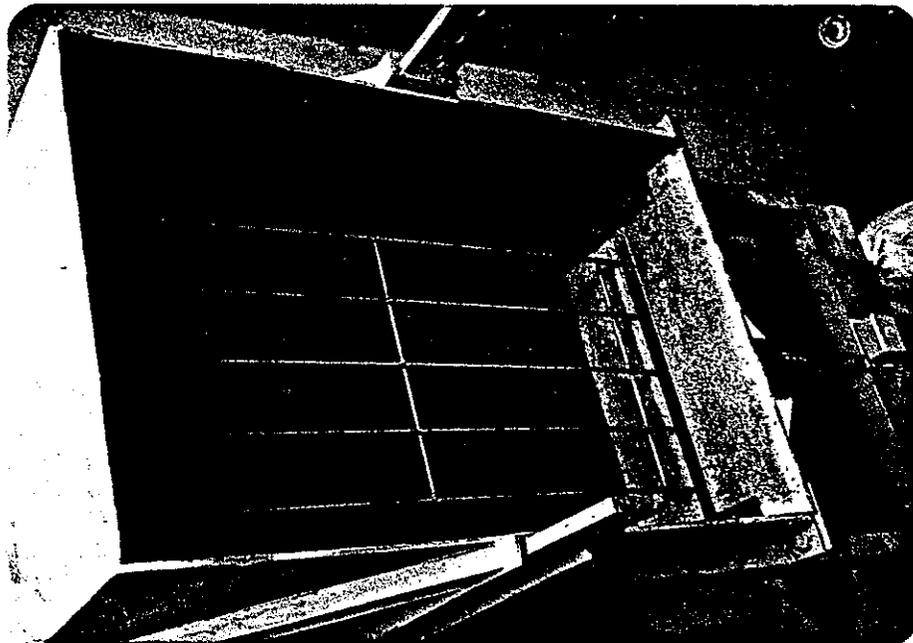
Large Scale Shear Box Used For Pull-out Testing of Soil Reinforcement
